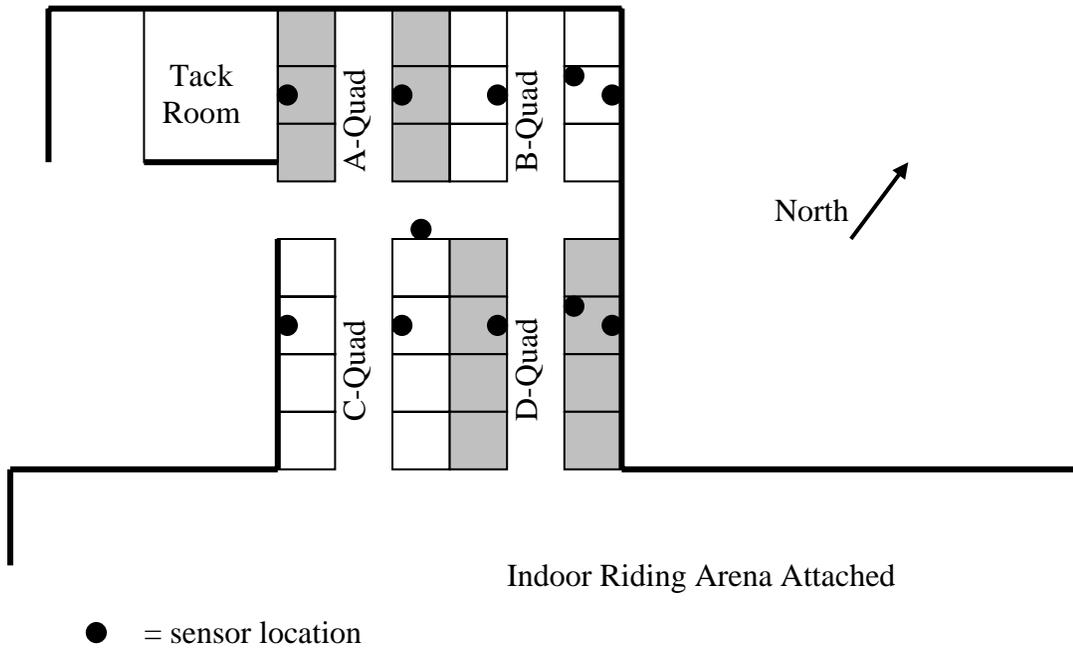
Plan view of 28-stall bank barn stable with attached indoor riding ring. North wall of stable is below grade.
